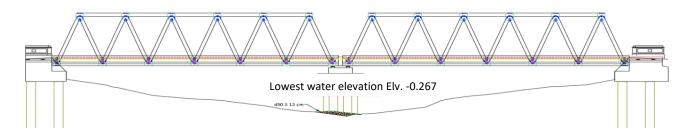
Front view of planned riprap design on Kuala Samboja bridge.
